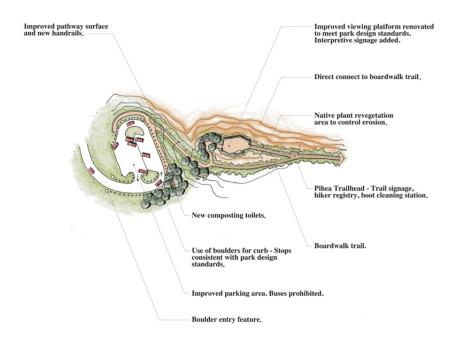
, Proposed Improvements to Pu'u o Kila Lookout
